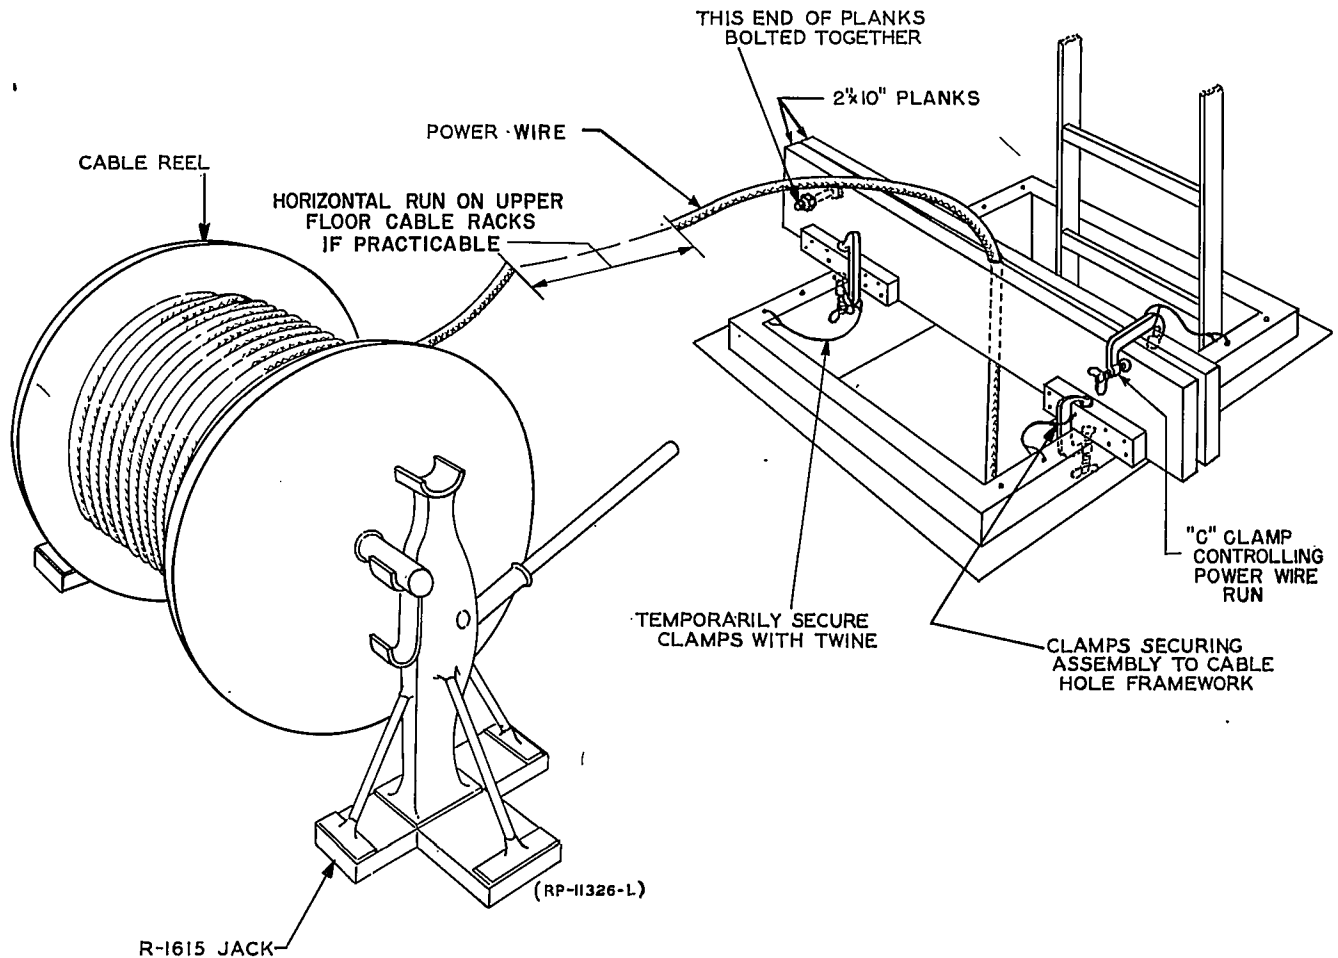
AN ALTERNATE ARRANGEMENT FOR CONTROLLING WIRE AT CABLE HOLE
